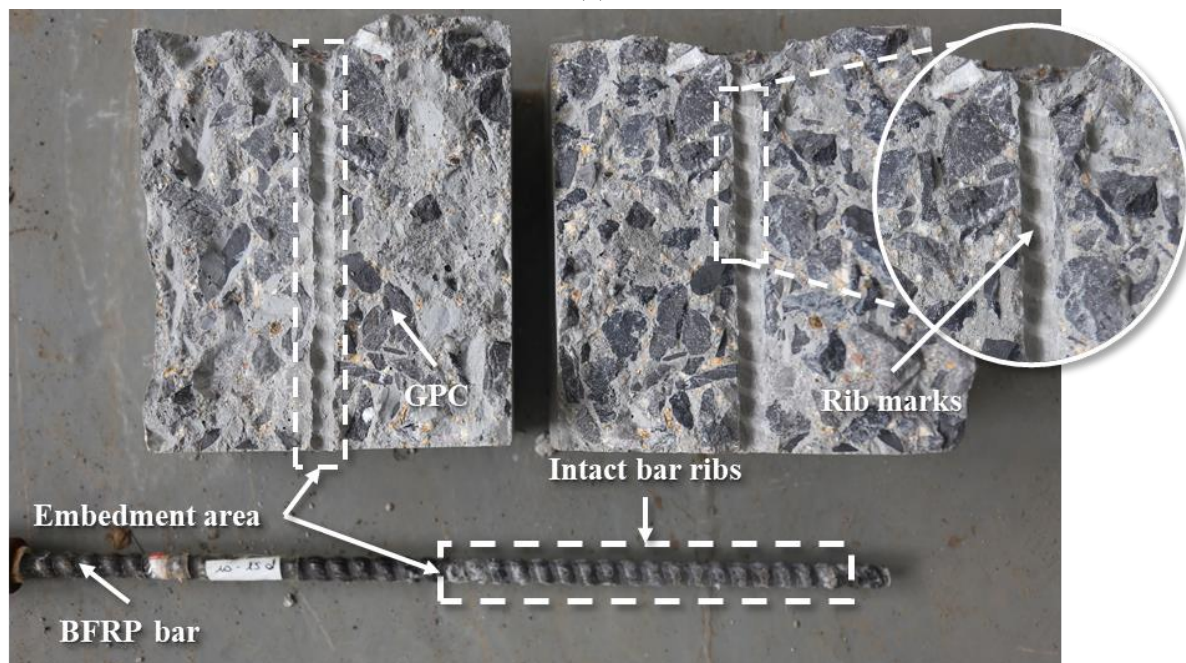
illustrates the sample 8-5d cut open to inspect the interface zone between the bar and the concrete, indicating that the pull-out failure was due to concrete lugs shearing off, causing the embedded concrete surface to become smooth, while the bar ribs were intact, implying a high rib shear strength and good integrity between the ribs and the successive bar layers. The pull-out failure usually occurs at the interface when the shear bond strength between the bar and surrounding concrete is exceeded. When the concrete provides an adequate amount of confinement to prevent splitting, the cracks remain limited to the portion surrounding the bar, leading to a pull-out failure (CEB-FIP, 2000). Bar pull-out is the preferred type of failure during pull-out tests, as it provides an estimation of the bonding between bar and concrete. On the other hand, concrete splitting and bar rupture are considered premature failures as the interface between bar and concrete is still intact after the sample failure (Tekle, 2017).
